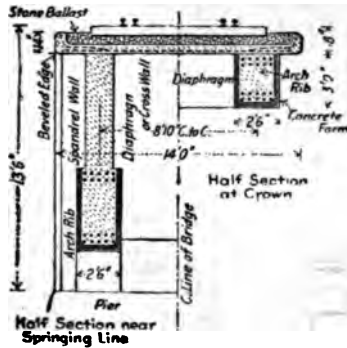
Half Transverse Section of Bridge at Belvidere, Ill.
